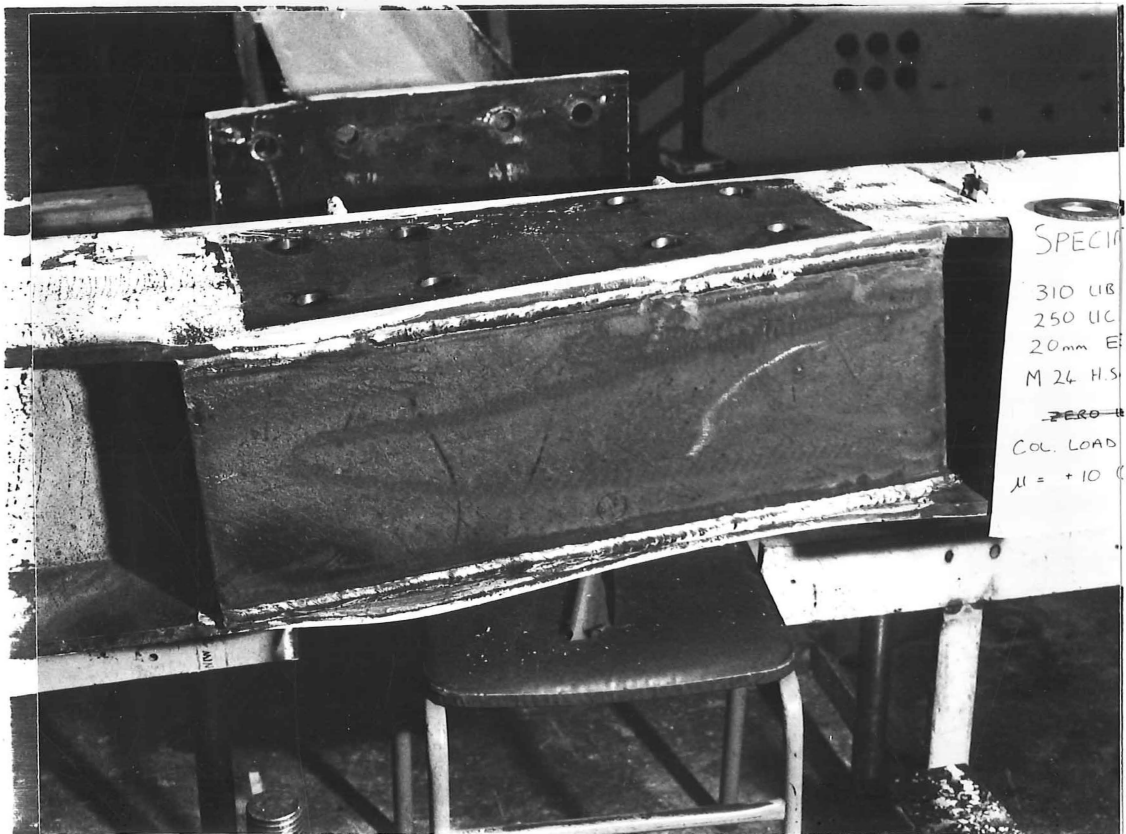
View of panel zone where fracture has occurred over the full length between one of the column flanges and its doubler plate butt weld, specimen three. Beam "A" side as shown here is on top
